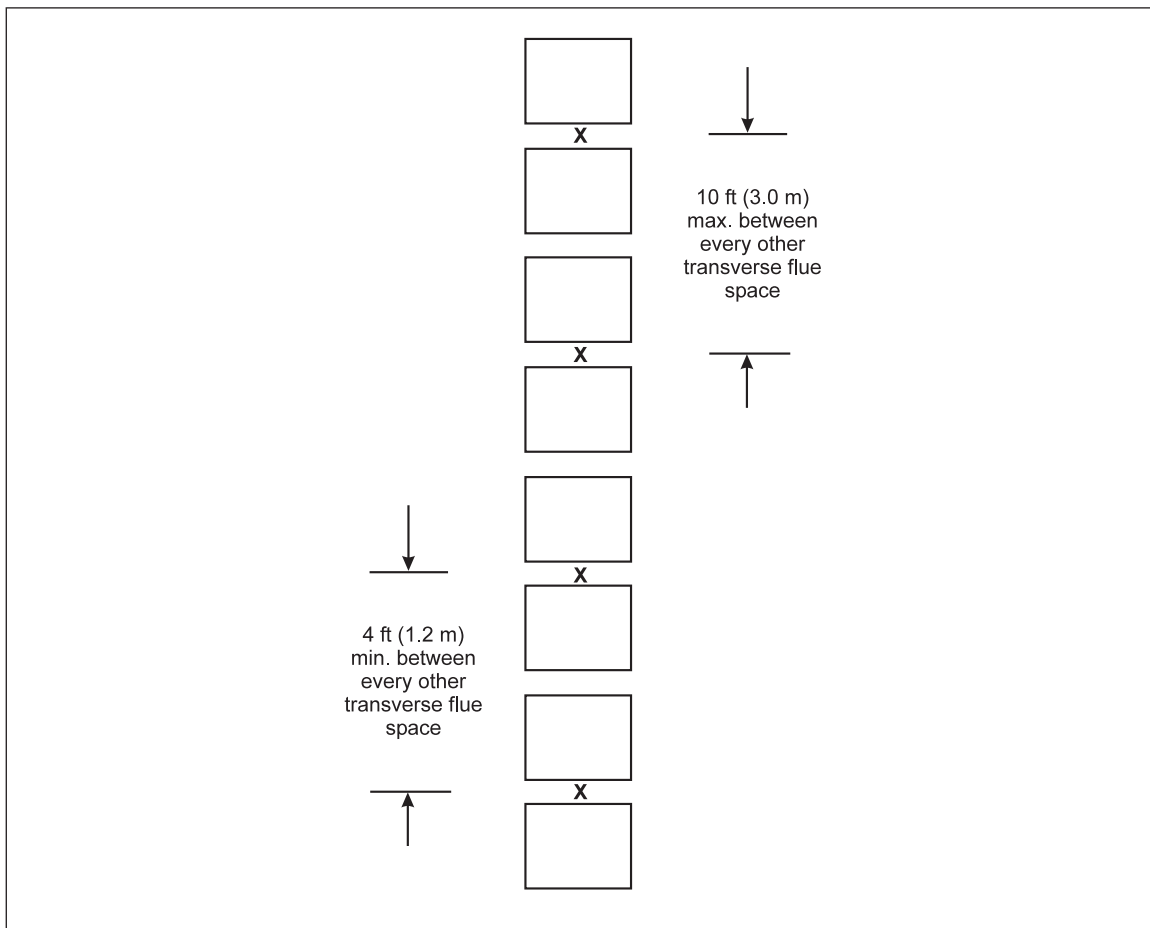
Plan view of IRAS(EO) in-rack sprinkler arrangement for single-row racks
